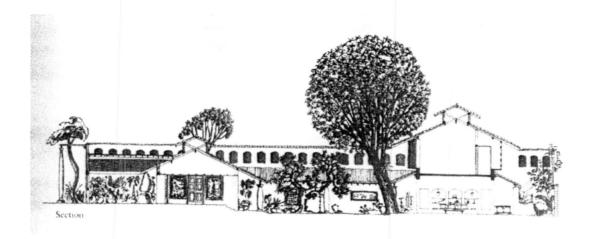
Section of Ena De Silva house. (Source: Geoffrey Bawa, p47).
